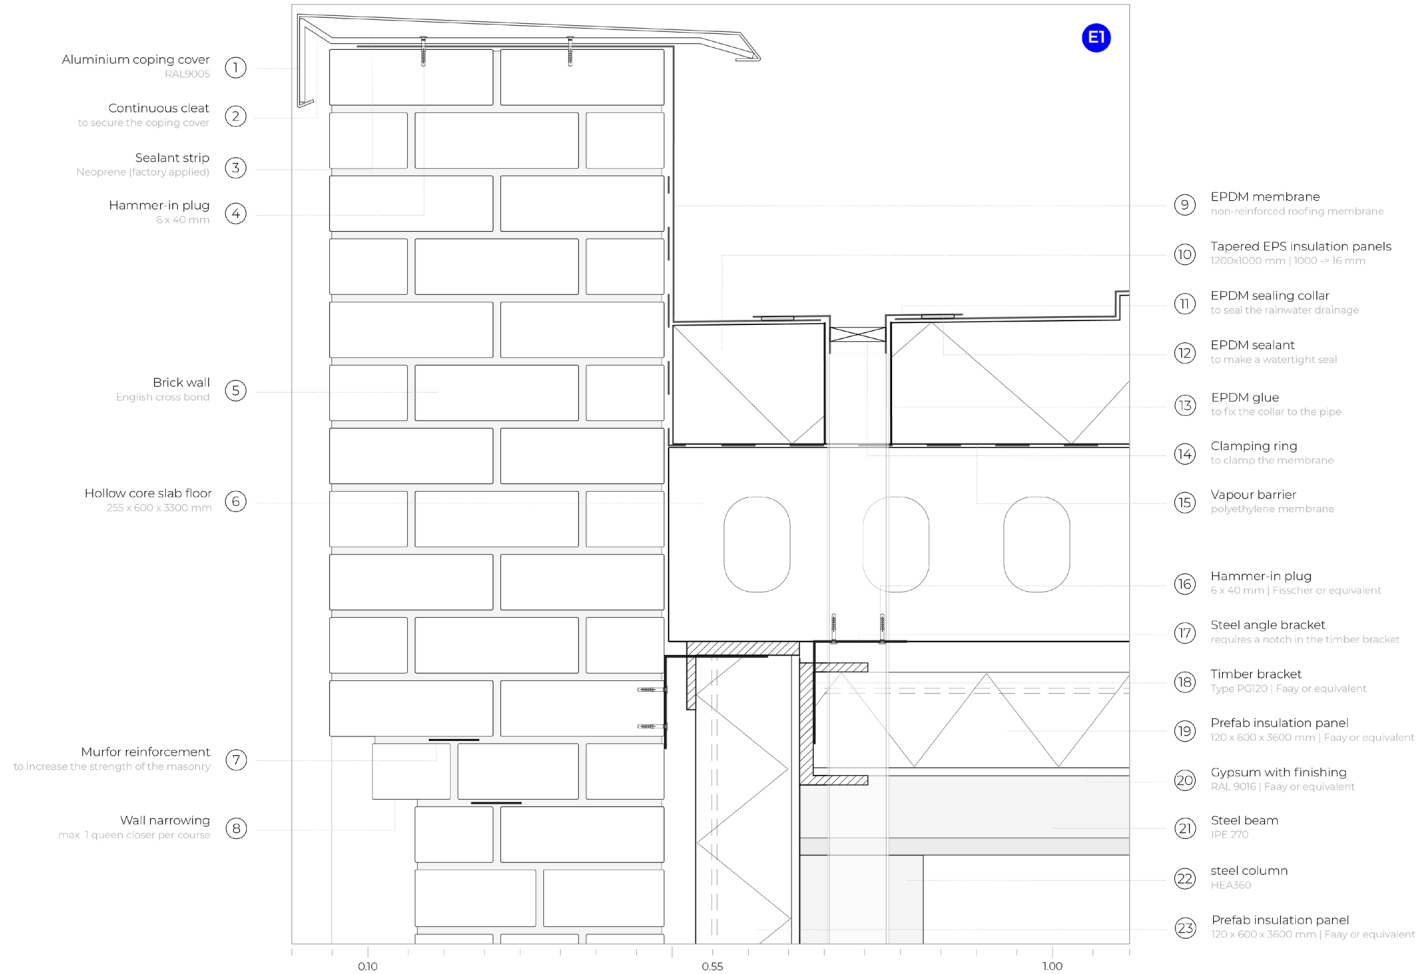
DETAIL DRAWINGS | VERTICAL SECTION D | SCALE 1:10
